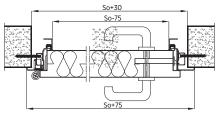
Installation of the ECO Tech single-leaf seamless door with a corner frame without a thermal break to a steel structure – horizontal cross-section
